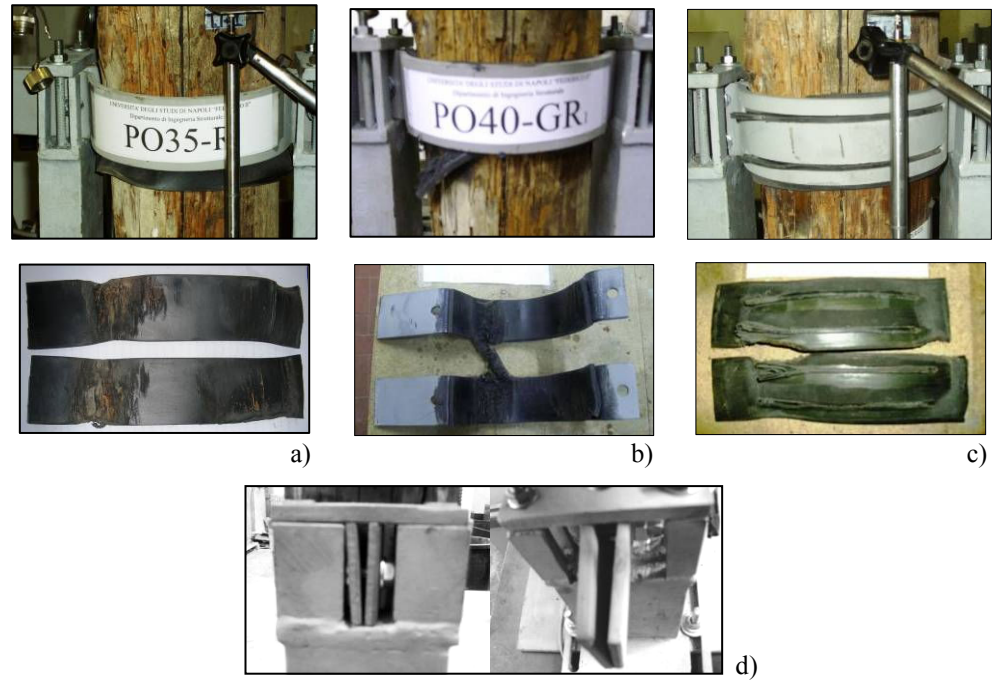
Monotonic push-out tests – Failure mechanisms: a) Simple contact (R); b) Glued contact (GR); c) Grooved steel collar (R-TS); d) Rotation between the collar parts (one bolt M10 per wing).
